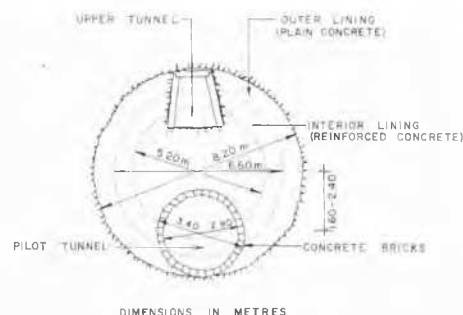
Proposed method of excavation utilizing the old Austrian method of pilot tunnels lined with concrete bricks.
